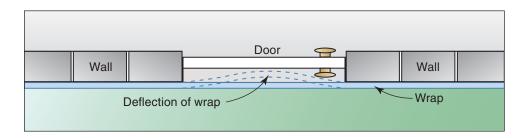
Plan view of wall section showing the deflection of a wrap at a doorway
